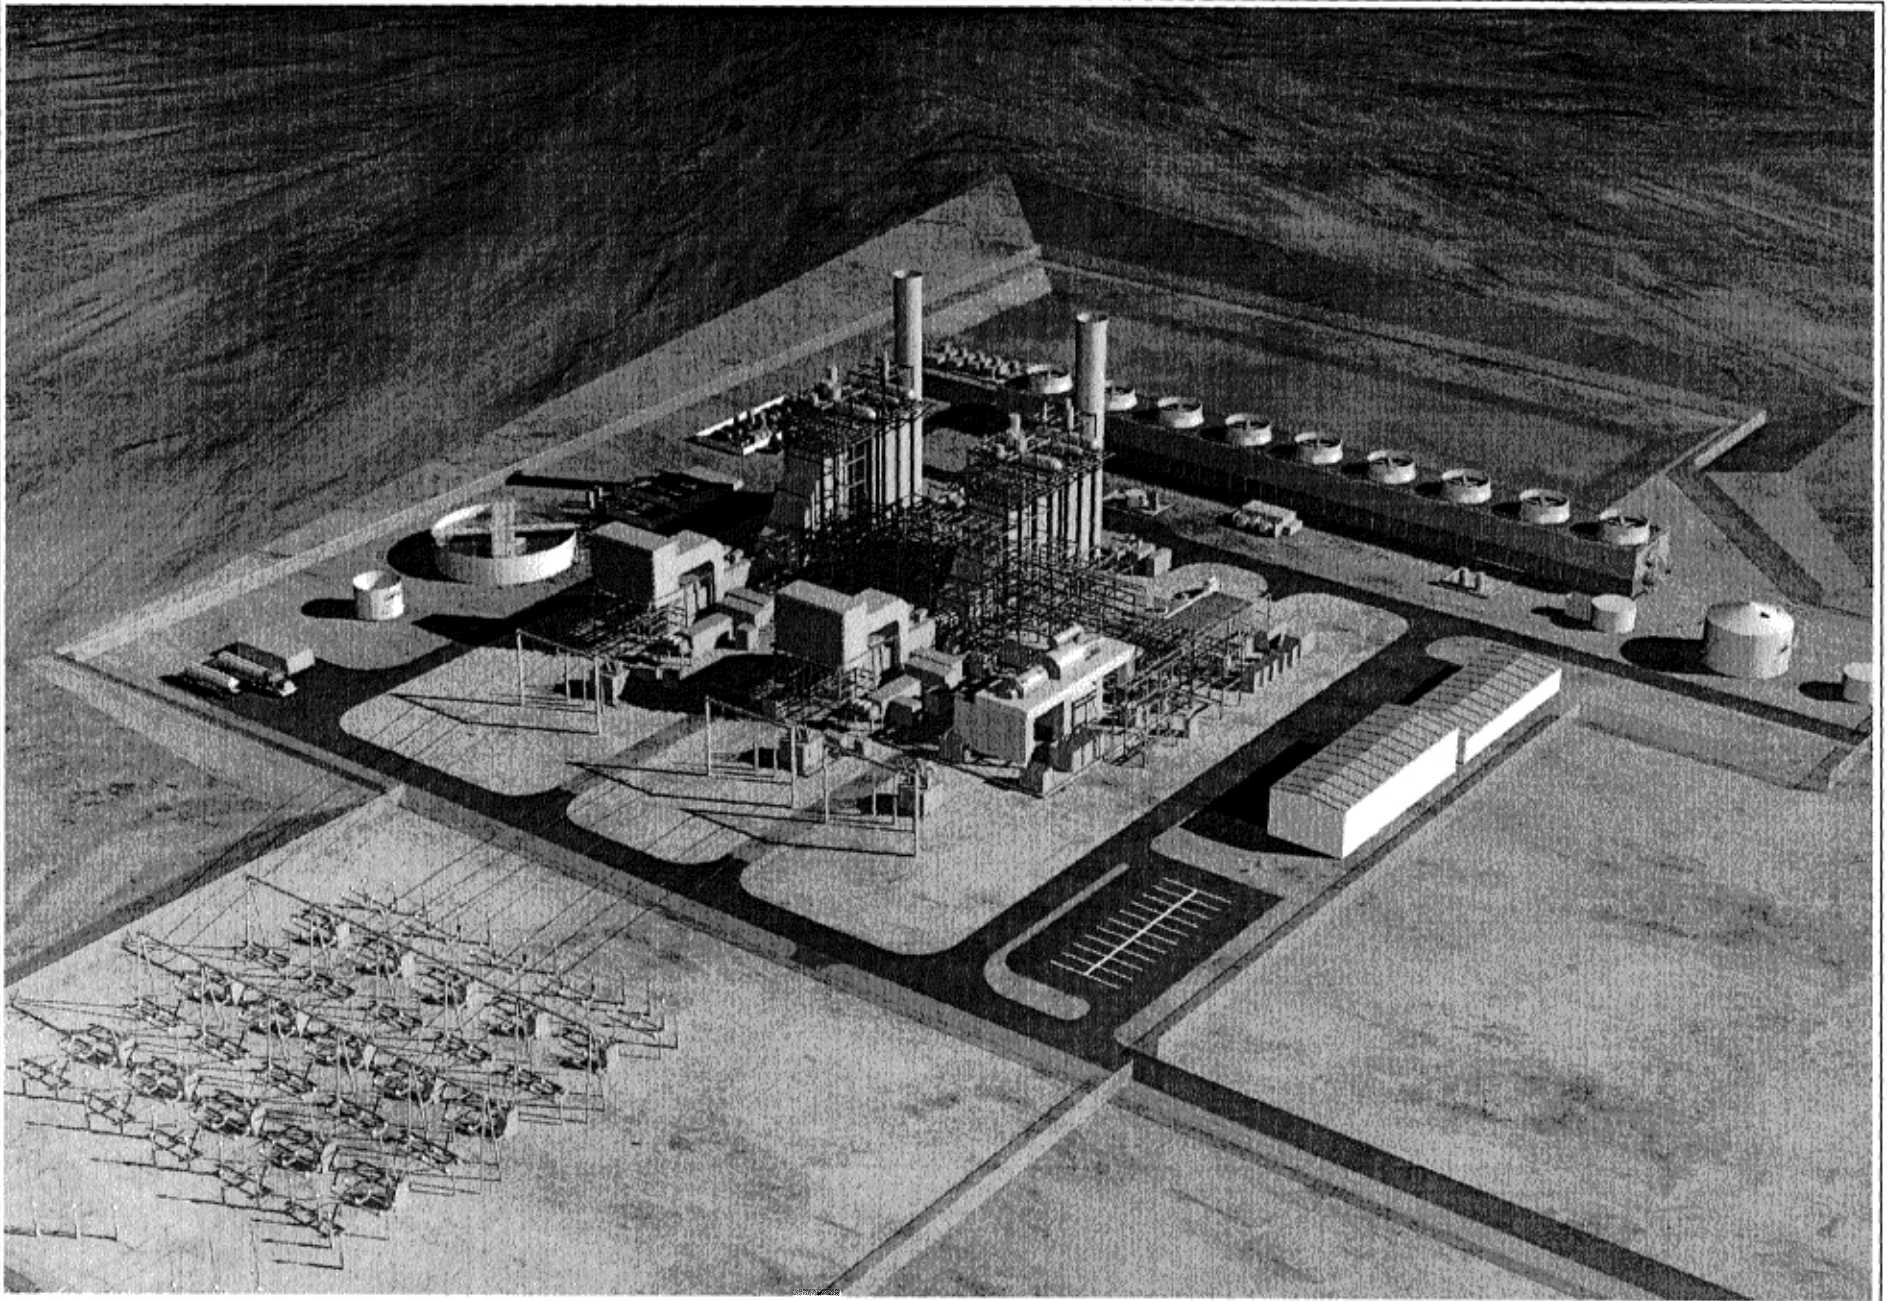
Proposed Site Plan, Jack County Power Plant
